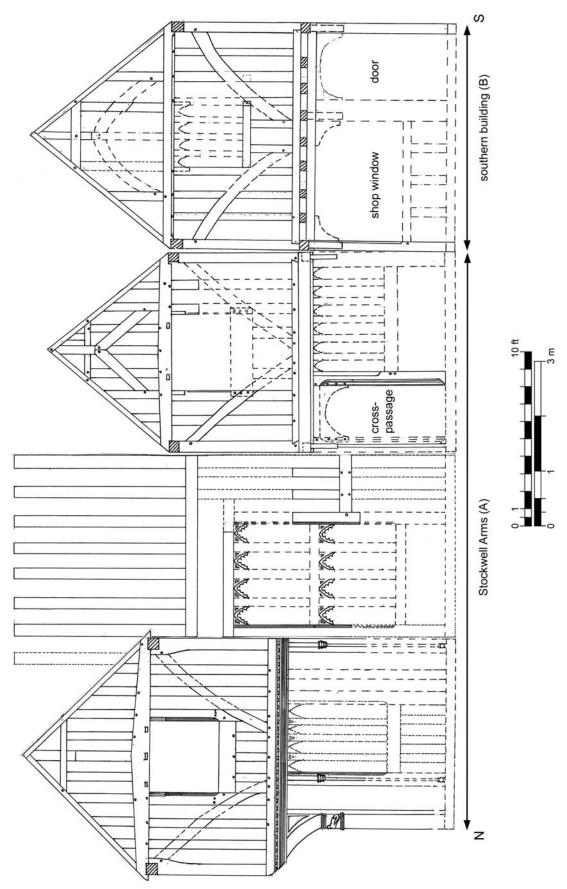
West (front) elevation of The Stockwell Arms, 18 West Stockwell Street (corpus no. 101) (including the house to the south, Part B). Drawn Richard Shackle
